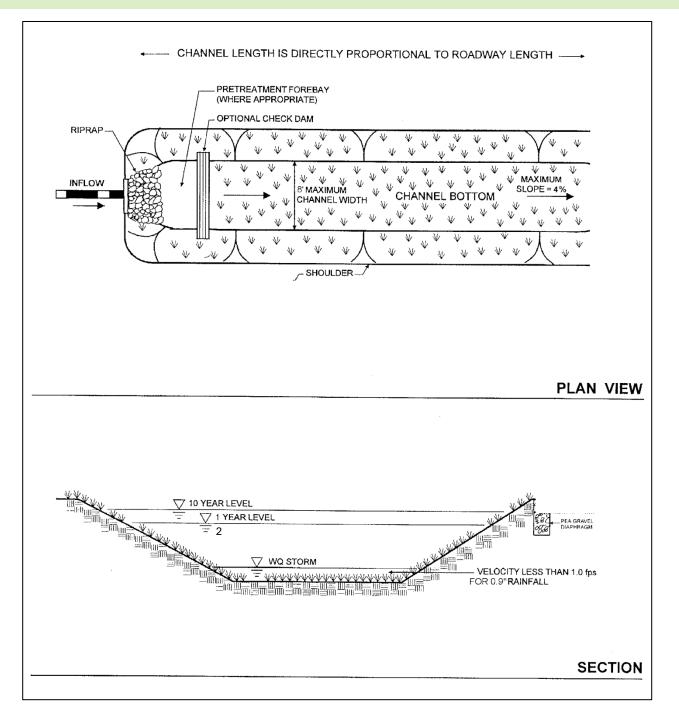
A.2. Grass Channel – Typical Plan, Profile and Section (Source: VADCR, 2011, MWS edited 2020)
